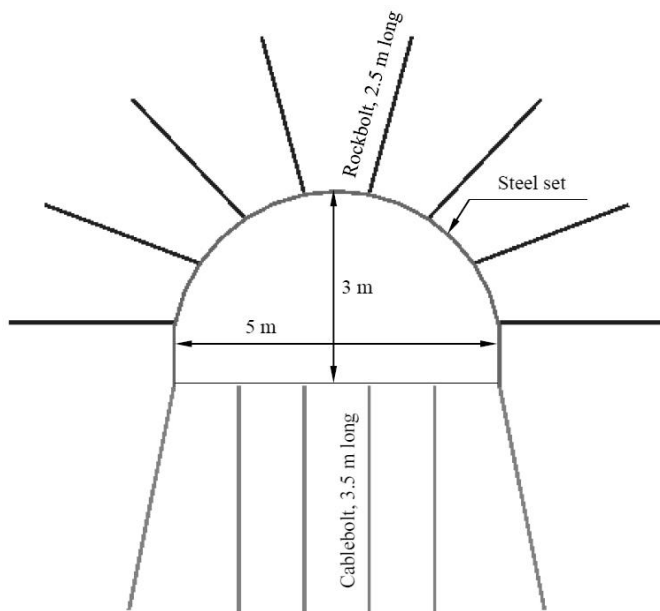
Pattern of modified support systems for roadway at 300 m overburden depth.
